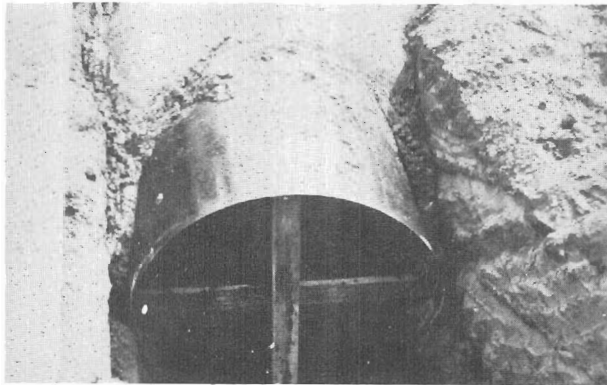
Placing lower portion of unreinforced cast-in-place concrete pipe. P214-D-33702, 33705, 33706.
